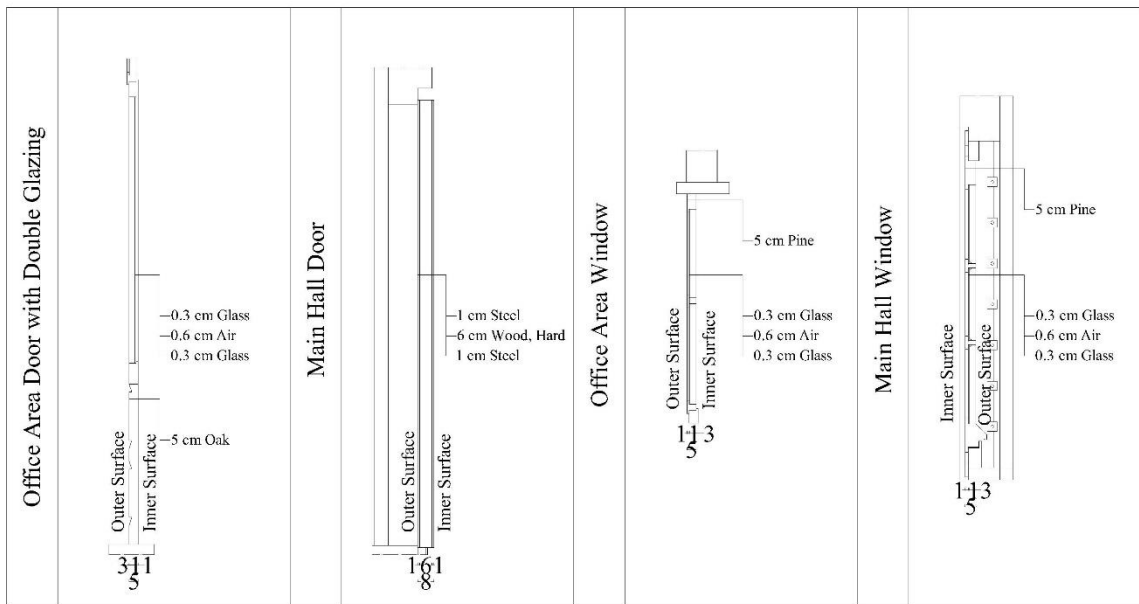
Sections of office area door, main hall door, office area windows and main hall windows (Source: Archive of Prime Ministry Directorate General of Foundations, 2019)
